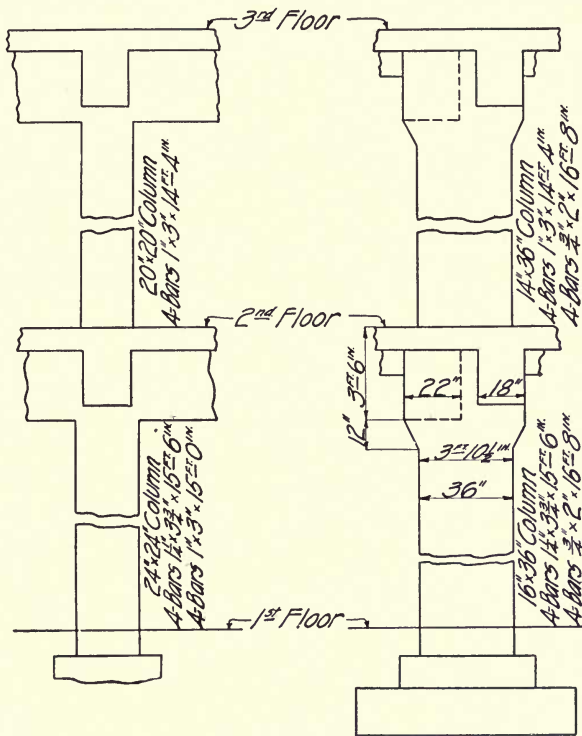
Typical Interior Columns in Packard Factory. (See p. 136.)
